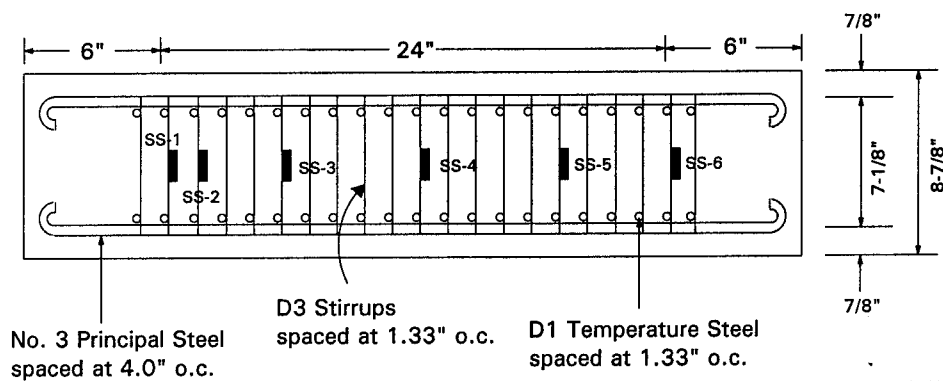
Strain Gage Locations on Stirrups in Slabs No. 7, 8, 9
